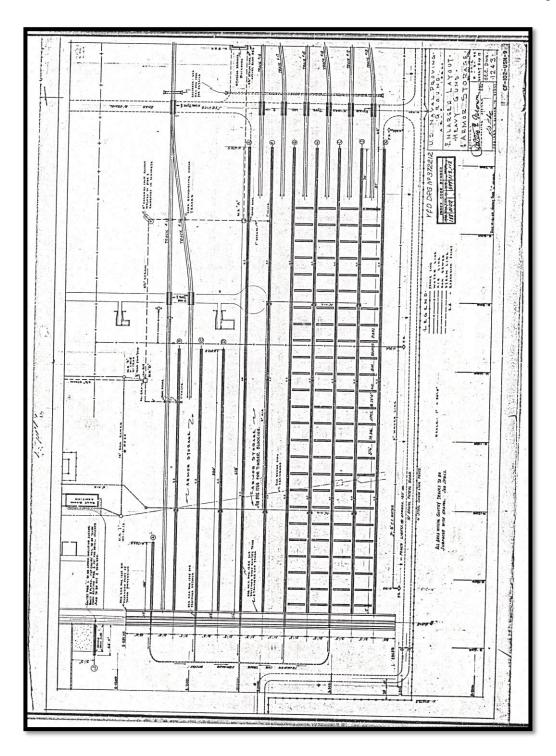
INL drawing number 112112 (CF-102-USN-9); storage yard, enlarged layout, heavy guns and armor storage; sheet 3 of 17; August 1944.
